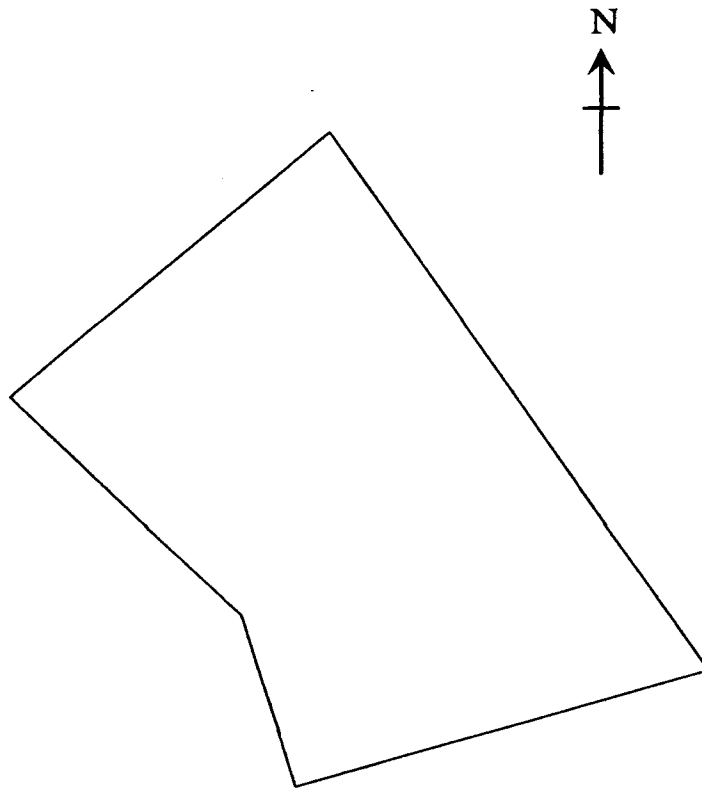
(a) : Sketch plan of proposed quarry (NOT TO SCALE)
